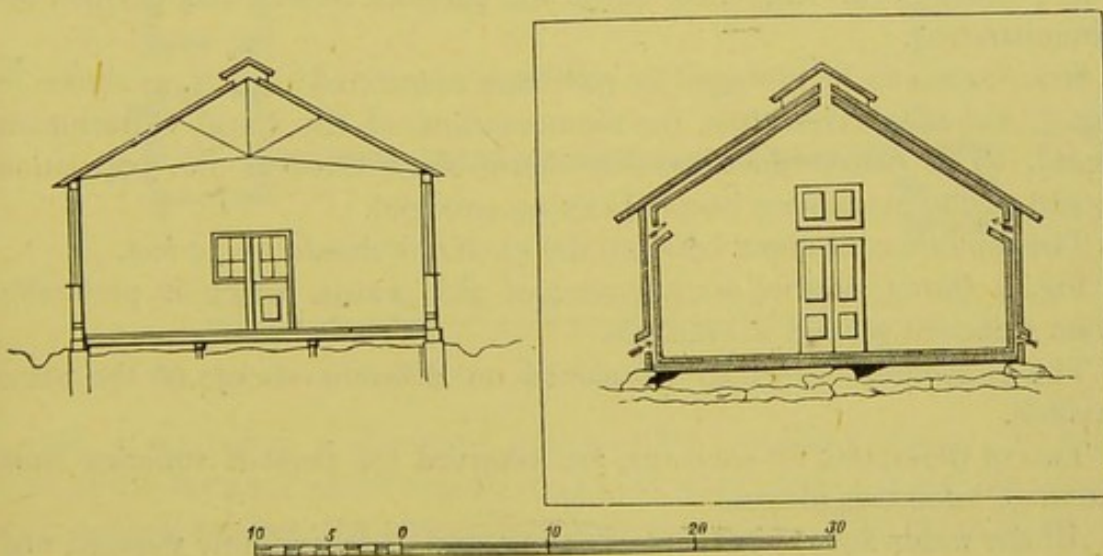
VERTICAL SECTIONS THROUGH THE SAME HOSPITAL.
